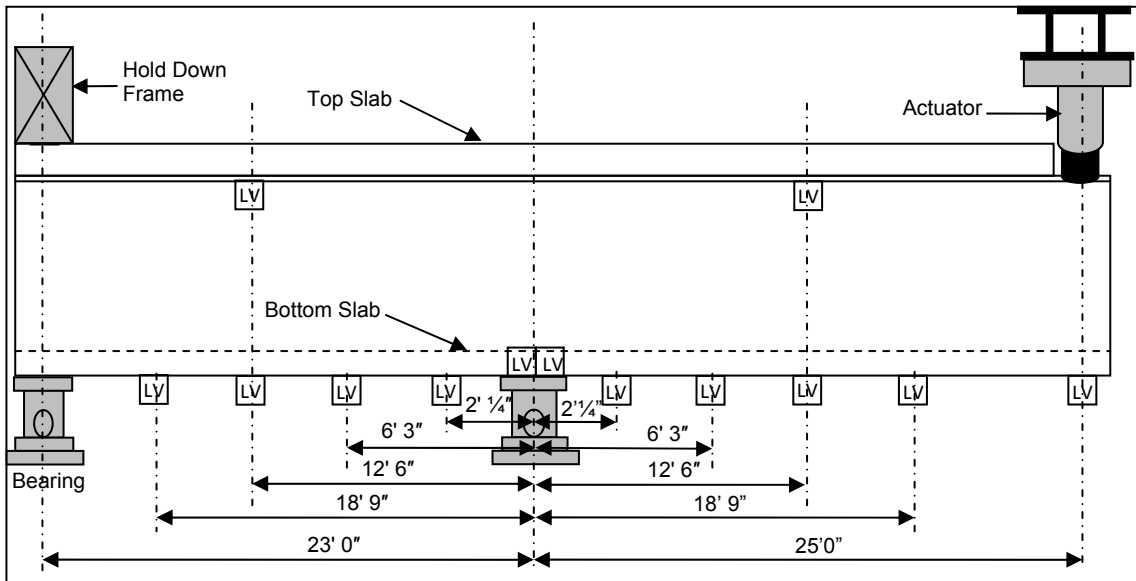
Elevation Layout of LVDTs Recording Deflection
